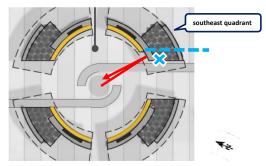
Comments for 12-Dec-2022 Concept Plan Southeast Quadrant
